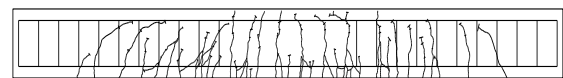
PU Strengthened Beam Crack Pattern
